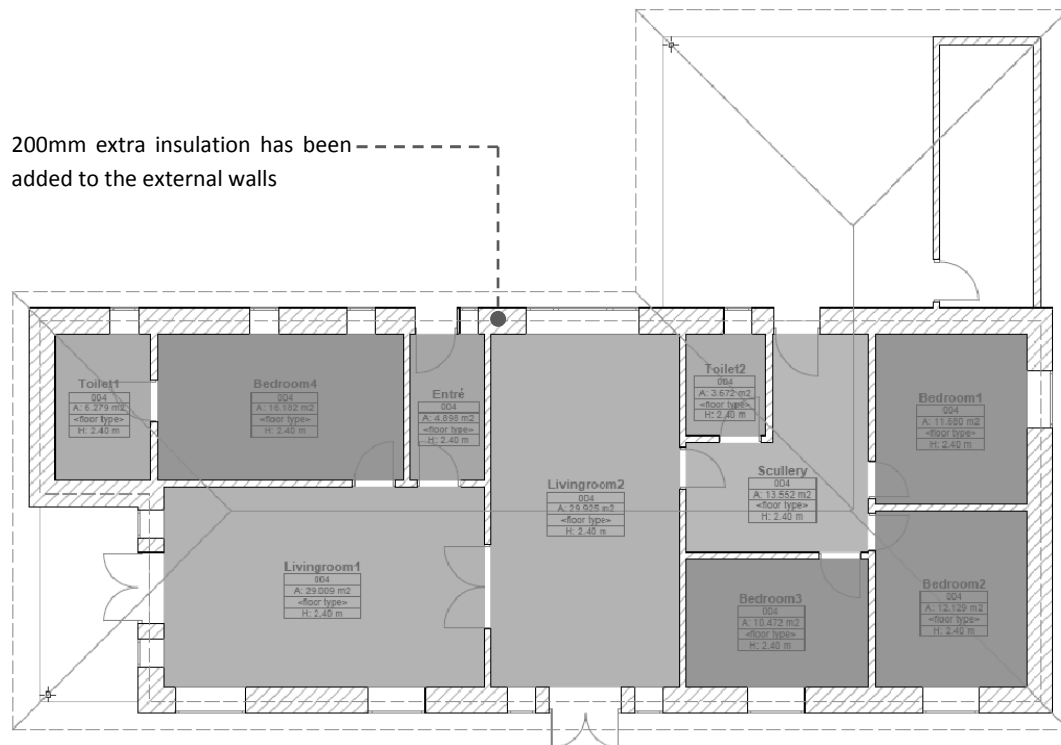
Floor plan of the design solution, where 200mm insulation has been added to the external walls. The floor plan is extracted from the BIM-model (Level 1.2)
